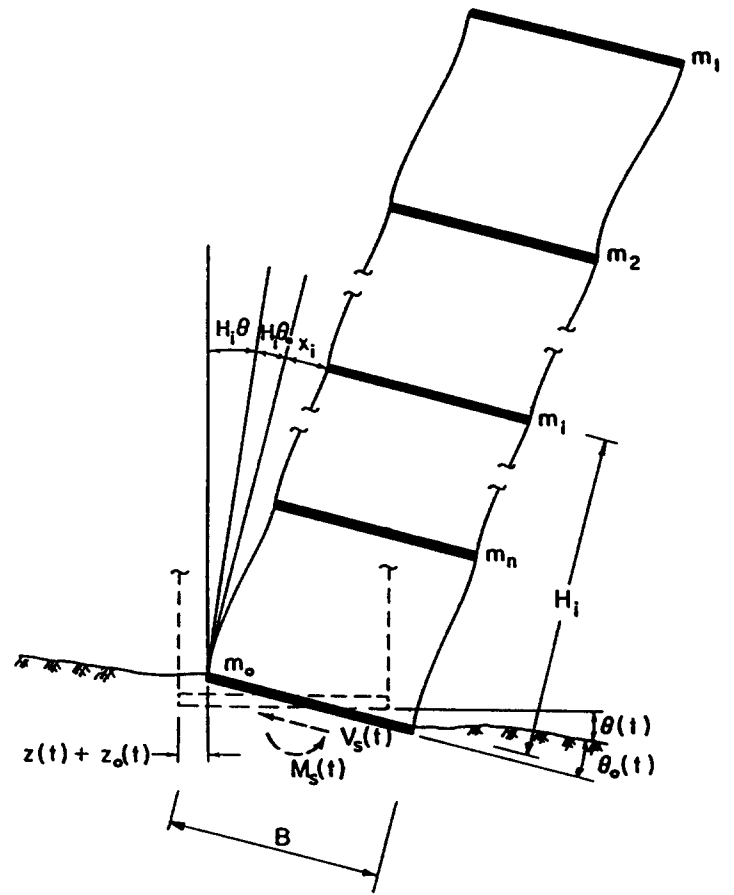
Idealized Building-Foundation System of a  $n$ -Storey Building
